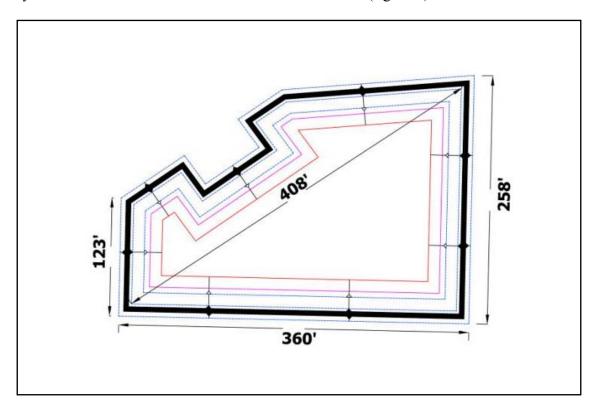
Alternative 4 - Permanent berm with impermeable geotextile at existing dewatering site.
